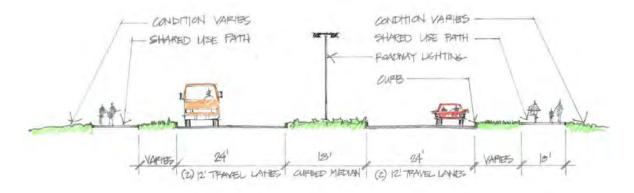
Park Avenue Conceptual 5-Lane Cross-Section, Bigler Road to Orchard Road 56
